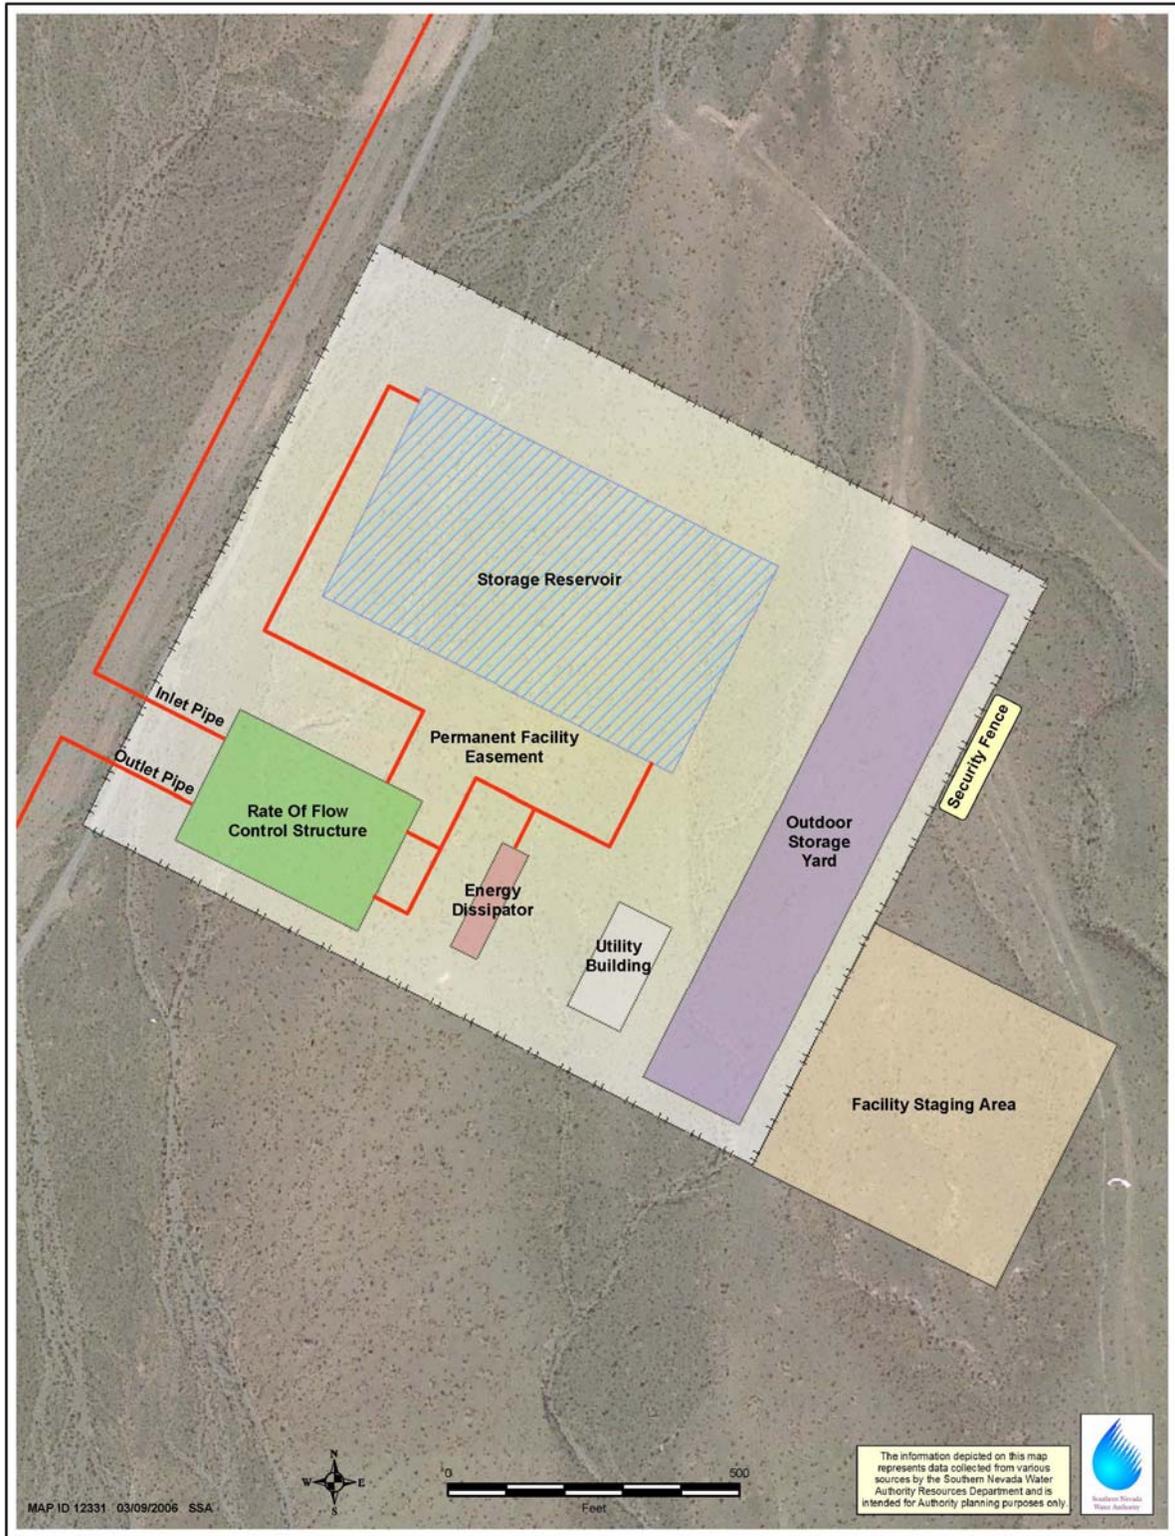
Conceptual Buried Storage Reservoir Site Plan
